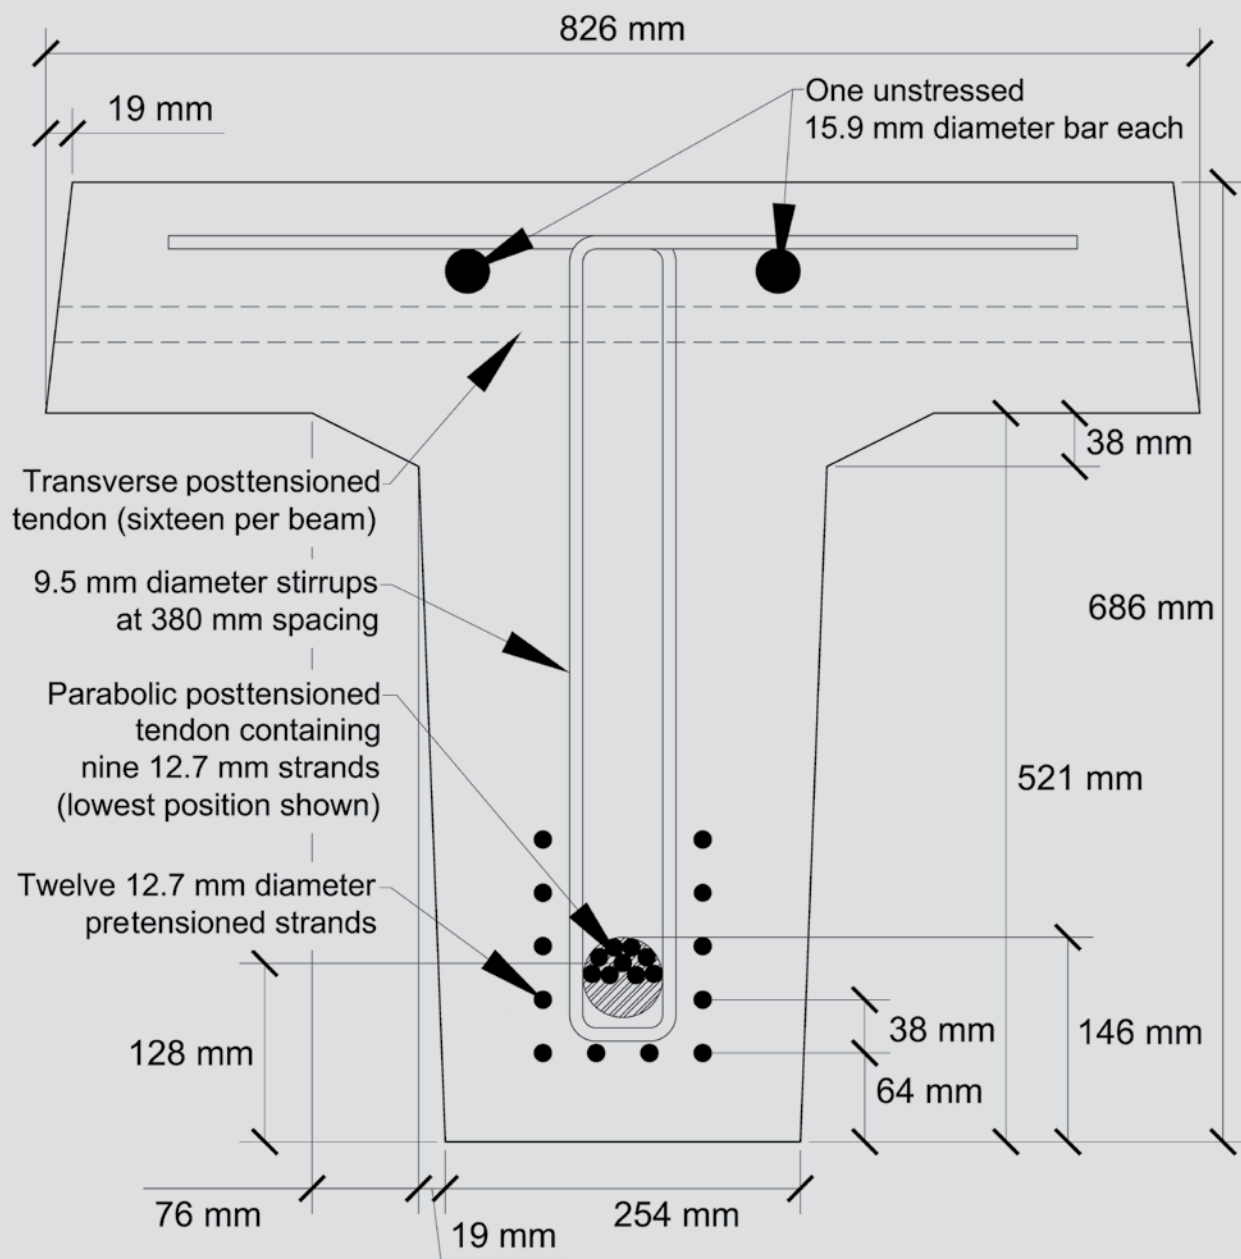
Typical beam cross section with posttensioned tendon duct shown at lowest point of parabolic drape. Note: 1 mm = 0.0394 in.
